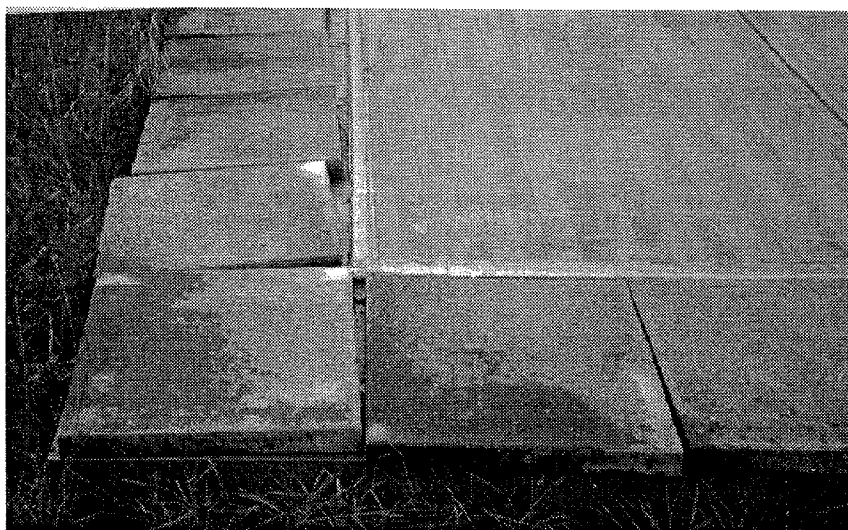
Photo of the same corner detail as above. The flagstones which should keep the construction tight are moved.
